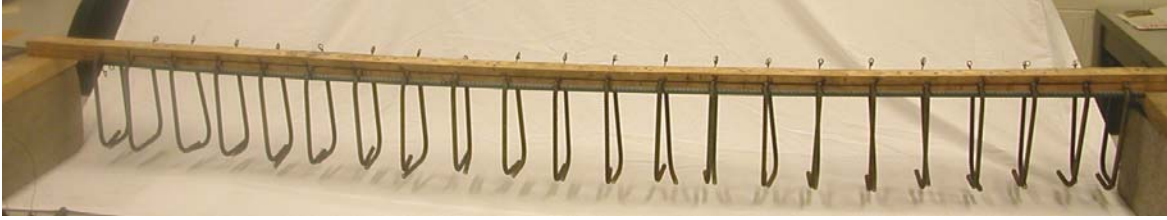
No. 3 (No. 10) bar stirrups mounted in wood jig to ensure 4 in. (100 mm) center to center spacing is maintained during the reinforcing cage construction.
